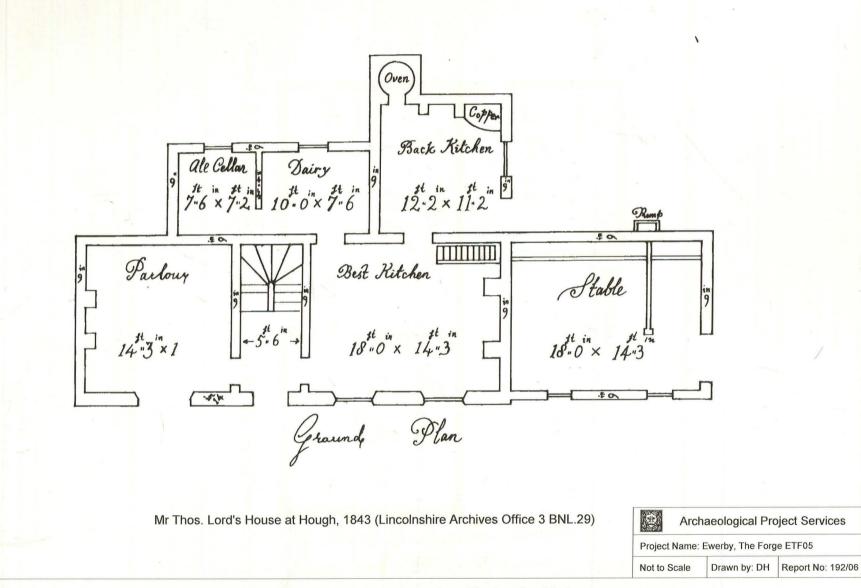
Plan of Building at Hough-on-the Hill, showing kitchen arrangements
